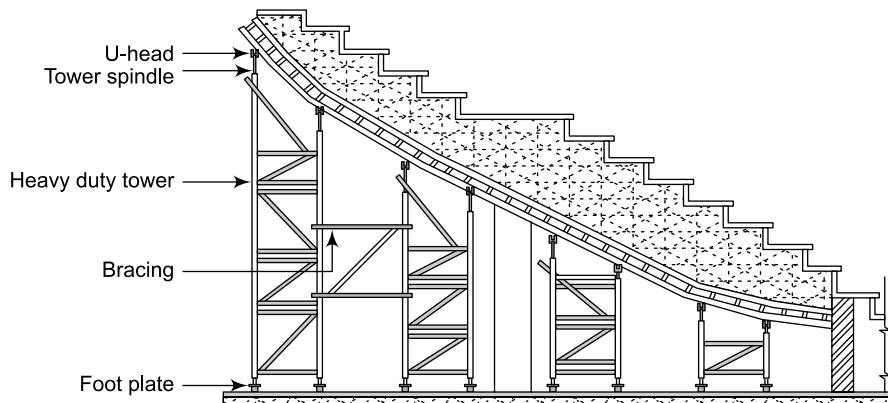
Typical Profile of the Curve Shaped Gallery Beam.
